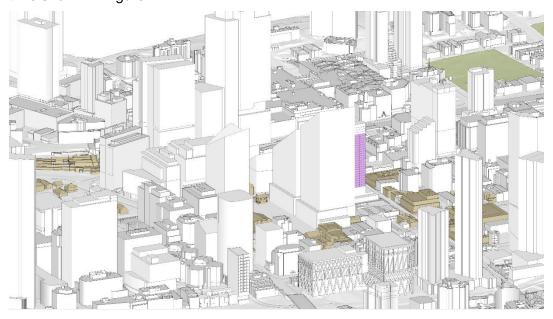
View from the sun, proposed envelope with Building B residential apartments shown in purple, 9am June 21
